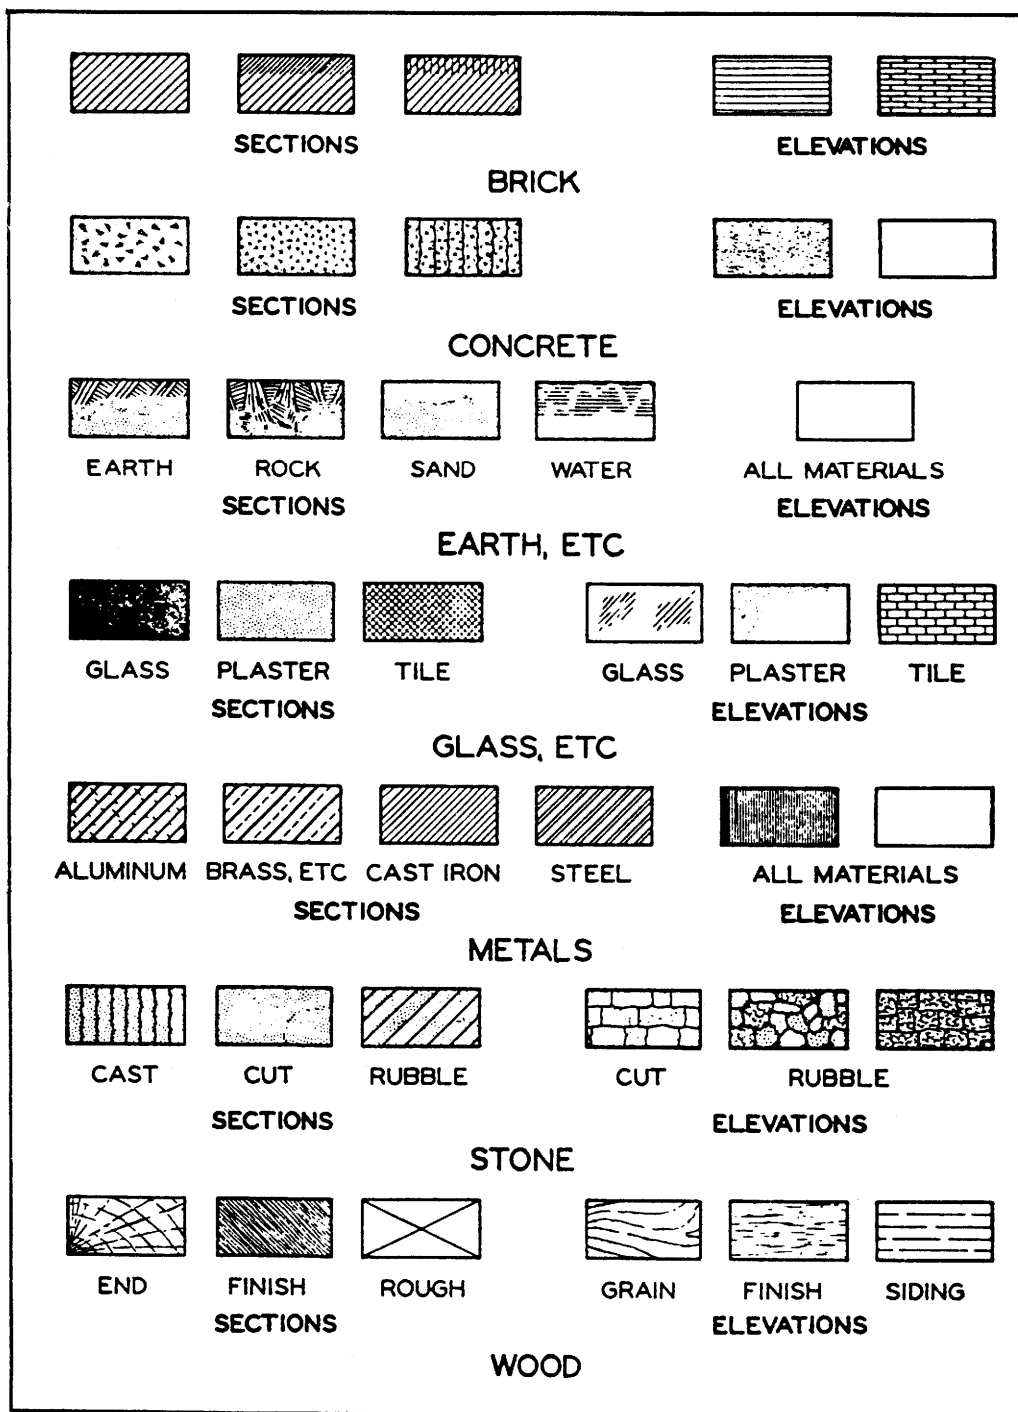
Common architectural symbols (for various materials) used in drawing sections and elevations.
